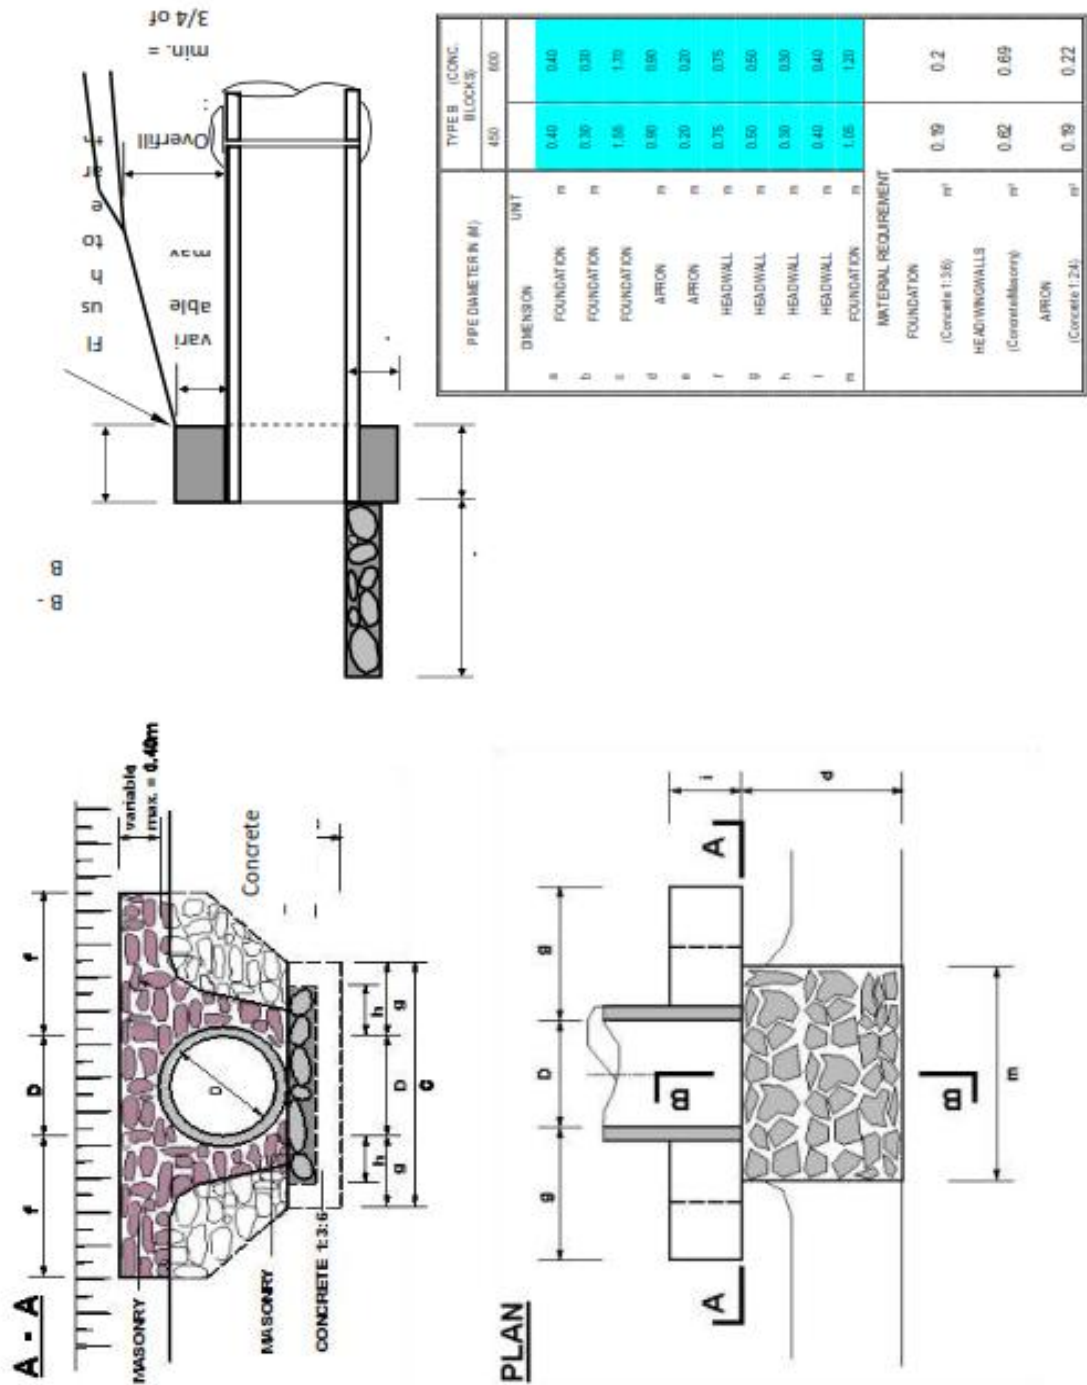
HEADWALL TYPE 4 (FOR ACCESS CULVERTS)
